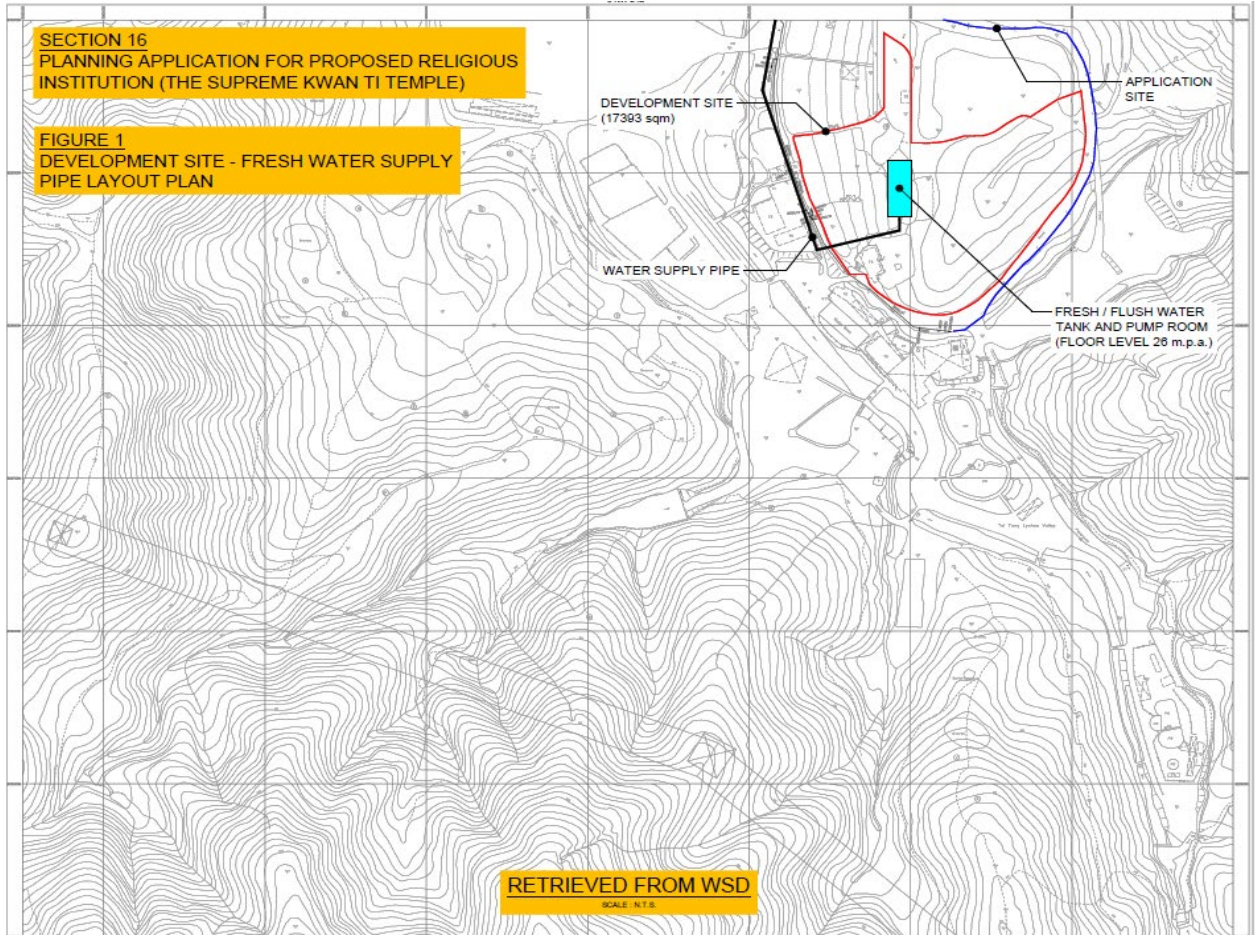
WSD Water Main Connection Point and Water Supply Pipe Layout Plan
